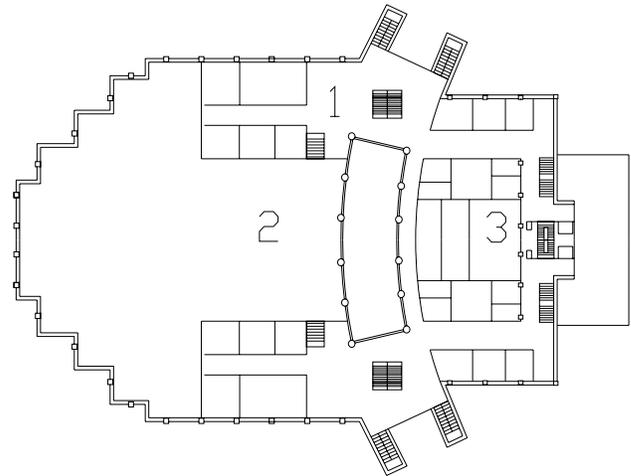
Basement level two floor plan of Putra Mosque (Ismail 2007)
